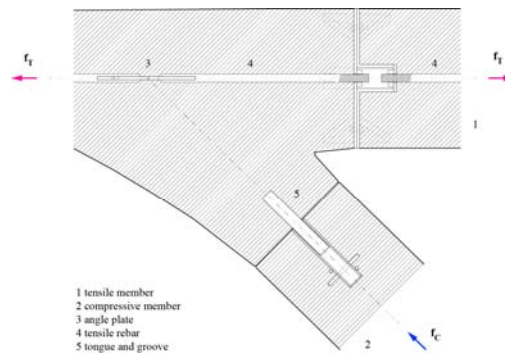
A section illustrating the connection details of a joint and its adjacent tensile and compressive members.
